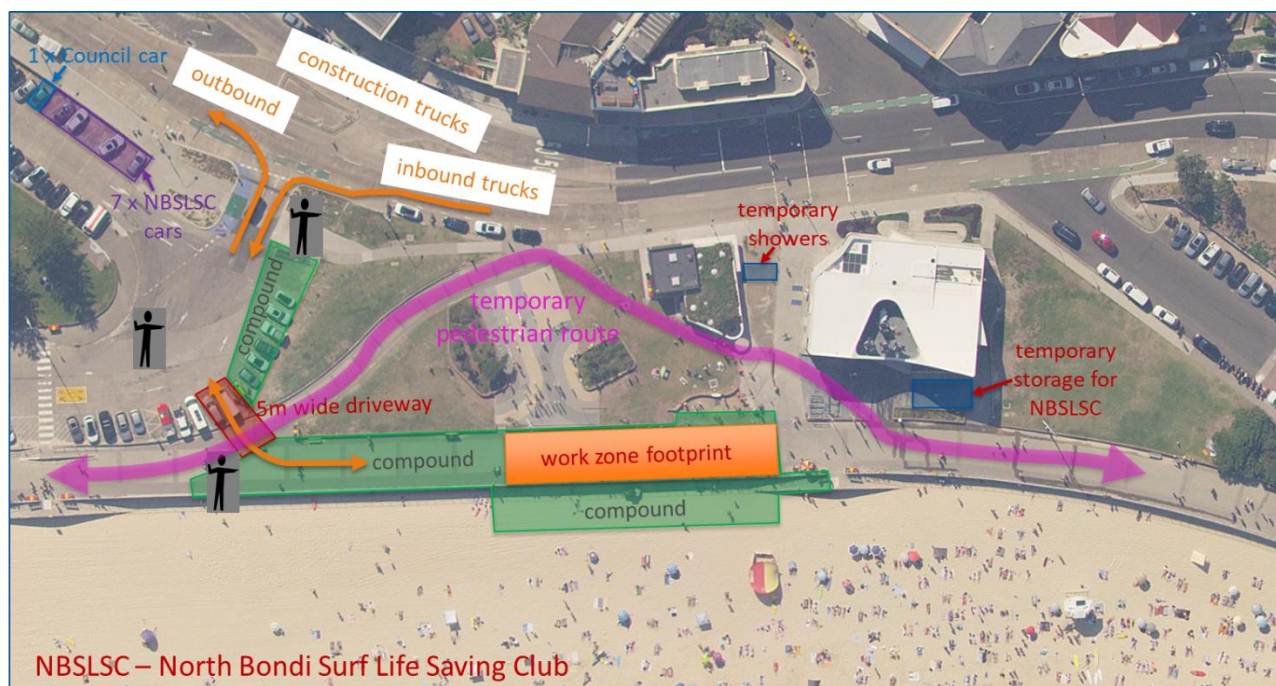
North Bondi Surf Life Saving Club Storage Project – Traffic Arrangements
